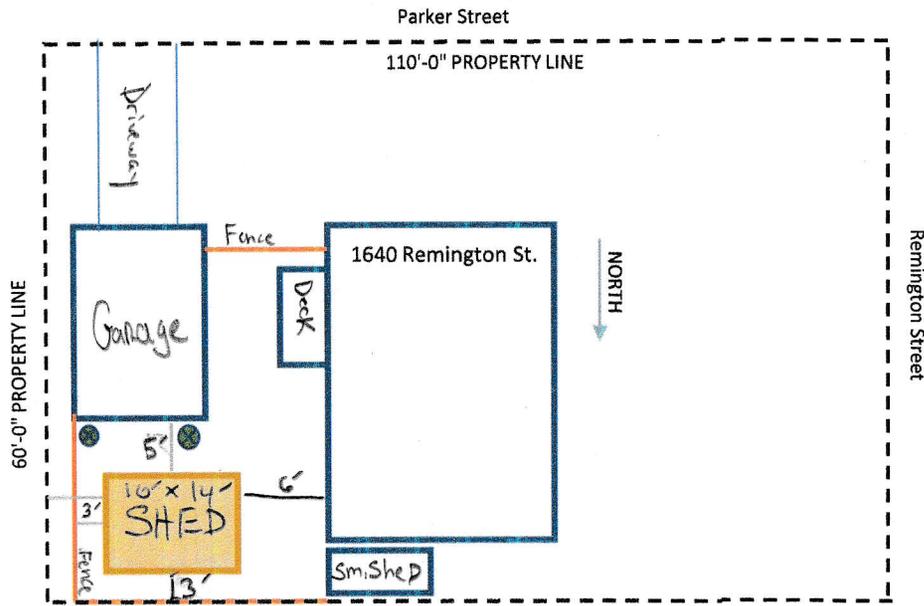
The proposed shed would face the back of our other neighbors' shed on its west side.
